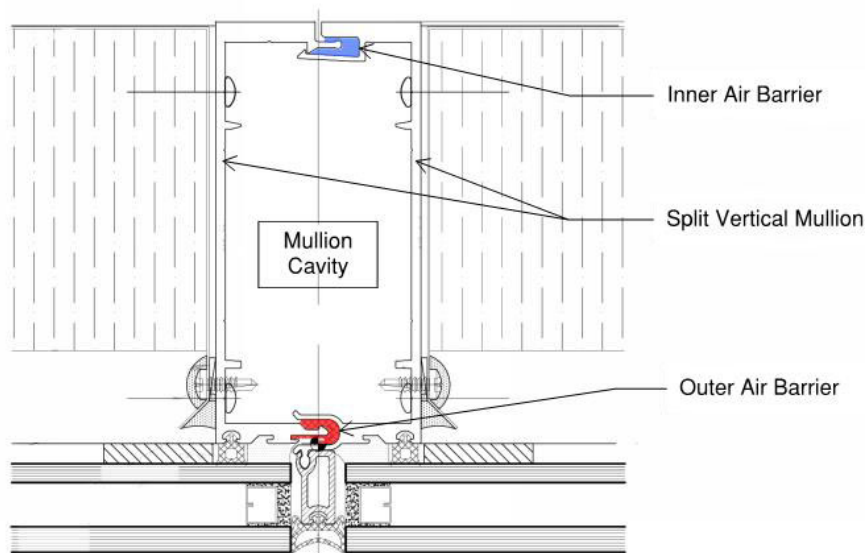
Unitized curtain wall split mullion showing the air barriers required for ventilation to the mullion cavity.
